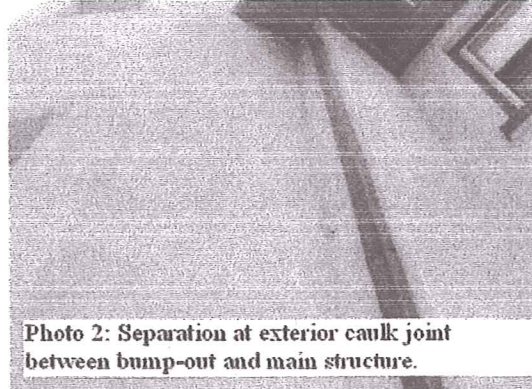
Separation at exterior caulk joint between bump-out and main structure.
